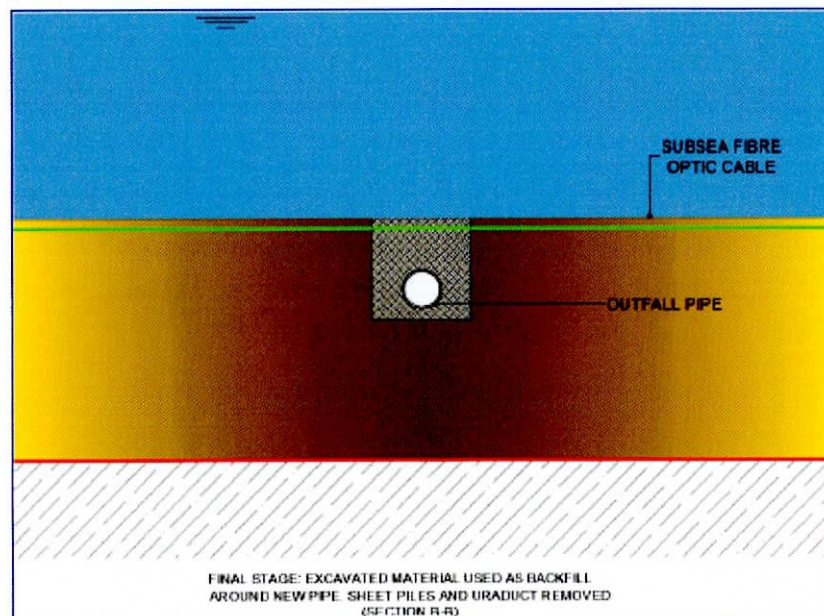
Fibre Optic Cable Crossing – Stage 3 – Backfill Trench
